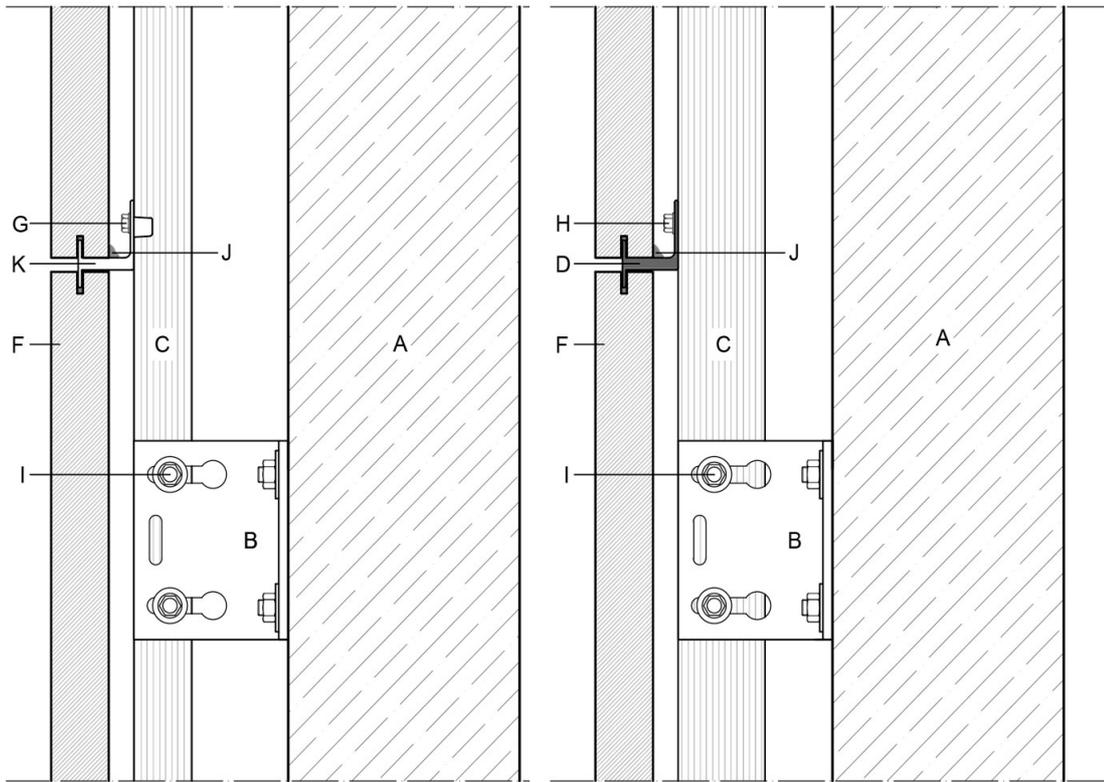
DETAIL OF SUBFRAME AND FIXING SYSTEM – HORIZONTAL SECTION
